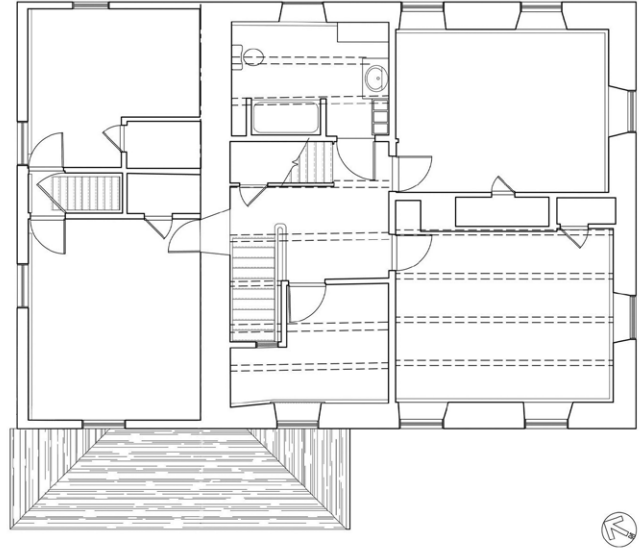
Second floor plan. Drawing by Michael Lockwood.
